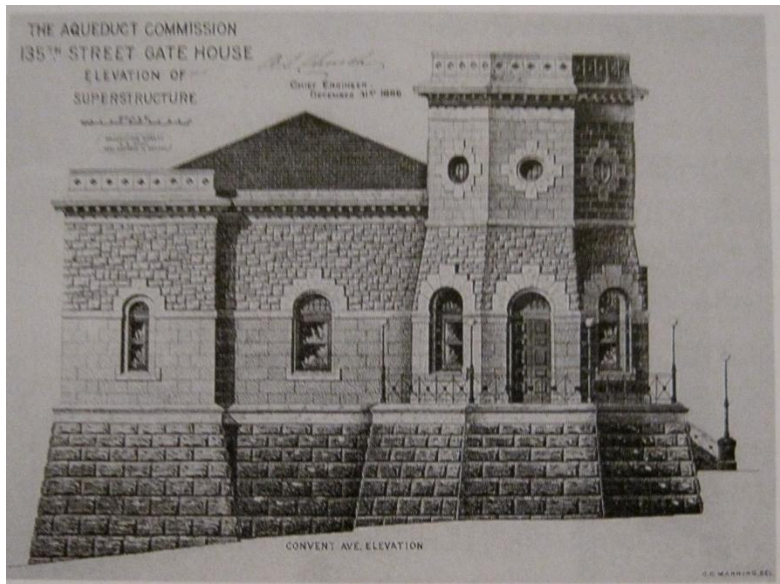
135th Street Gatehouse, Elevation of Superstructure, from *Report to the Aqueduct Commissioners*, 1887.
